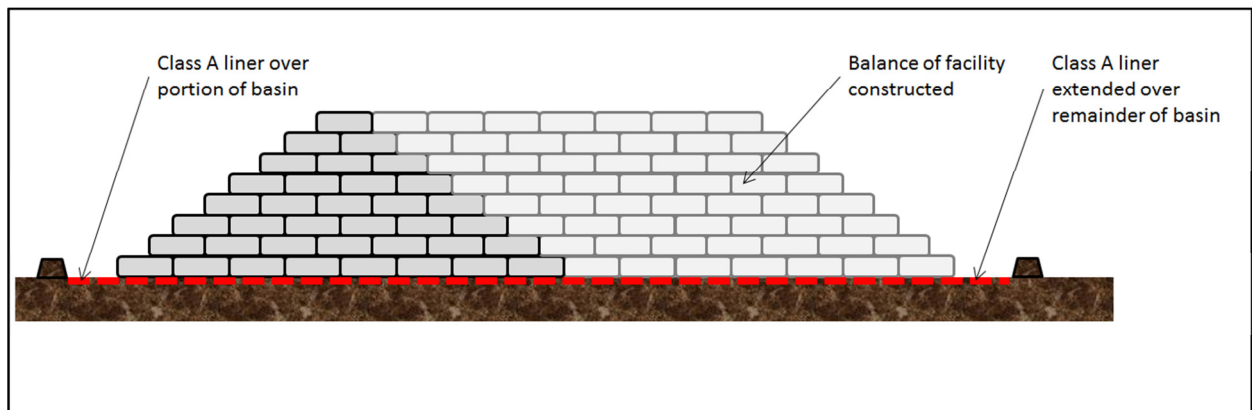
INITIAL PORTION OF SLAG DUMP CONSTRUCTED
